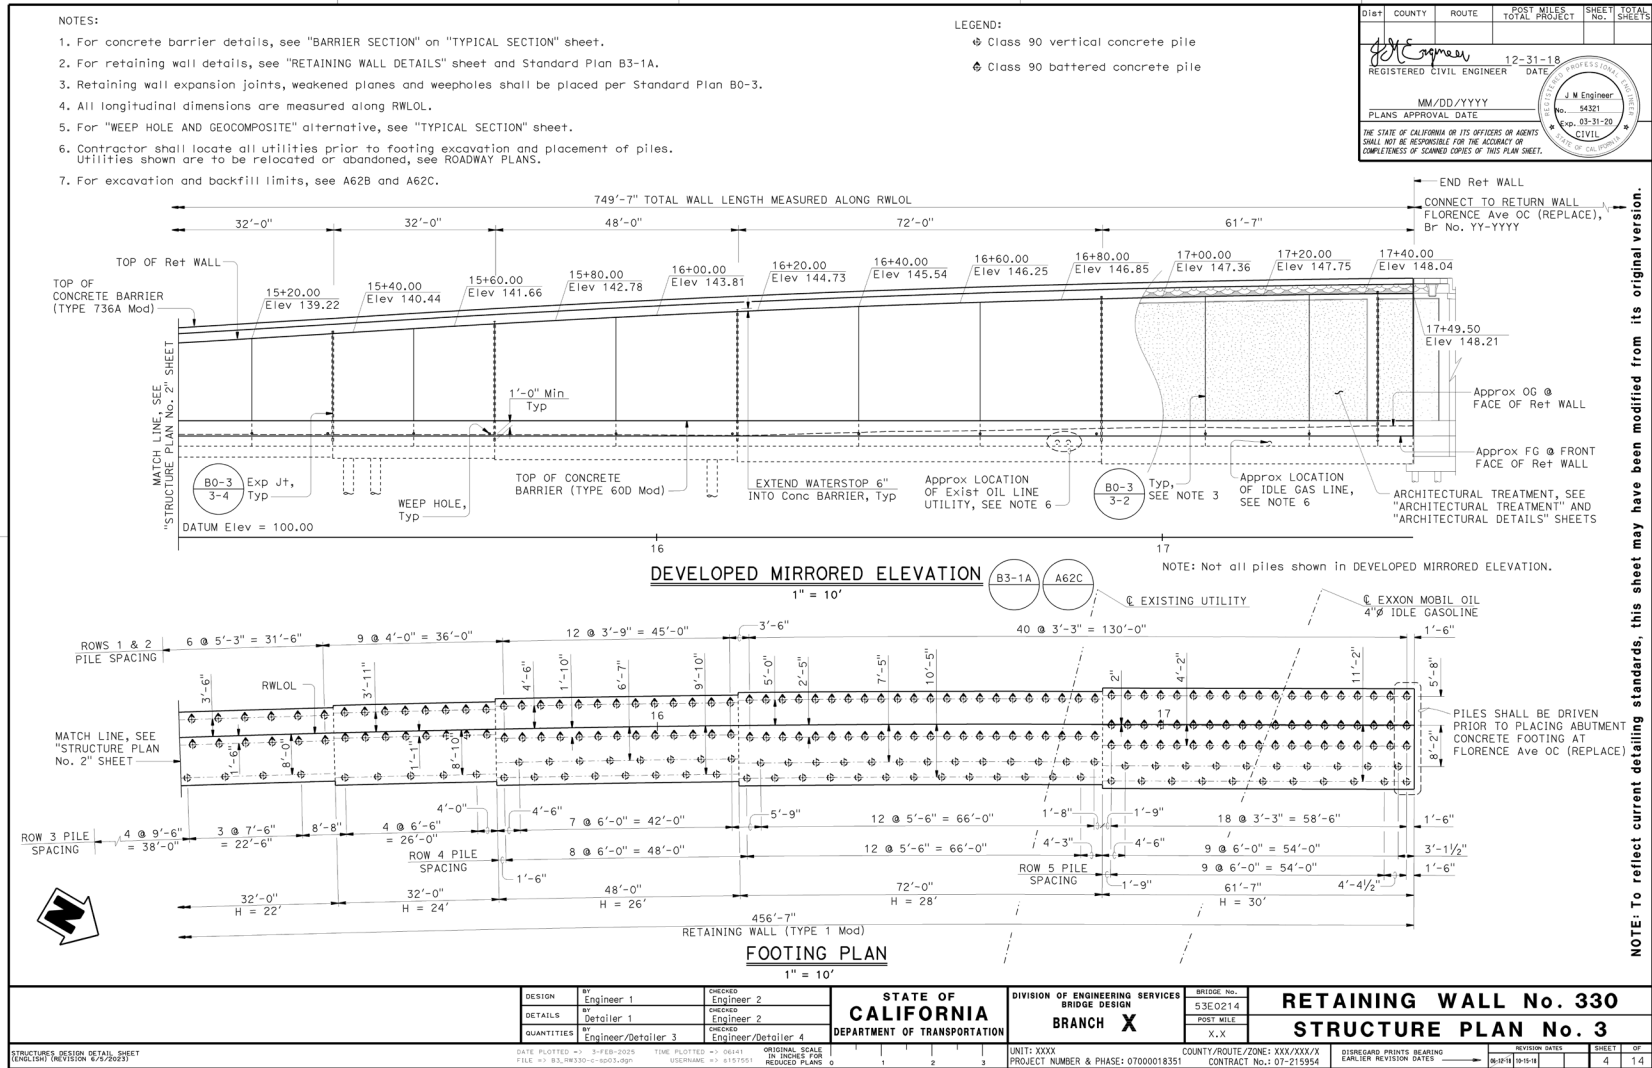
A.C.4 Modified Standard Retaining Walls (Types 1SW, 5SW or 7SW) Detailing Example
